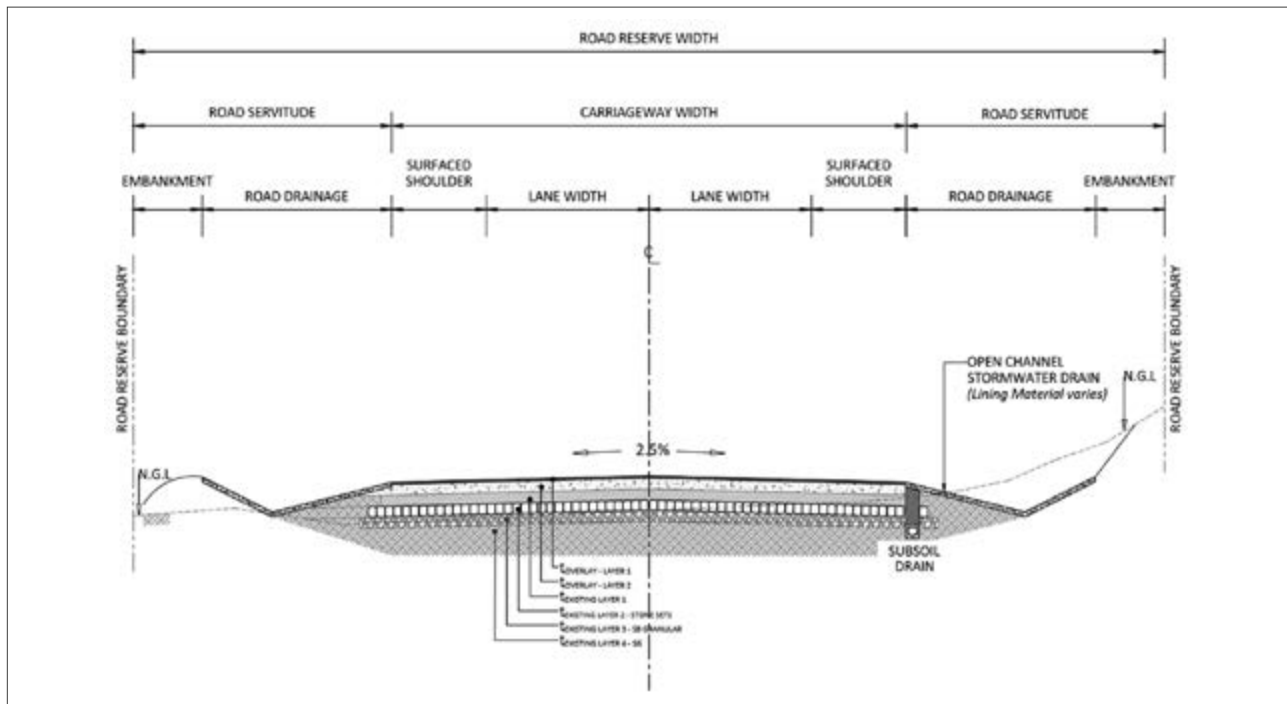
Illustrations of Peri-urban Pavement Structures and Services
